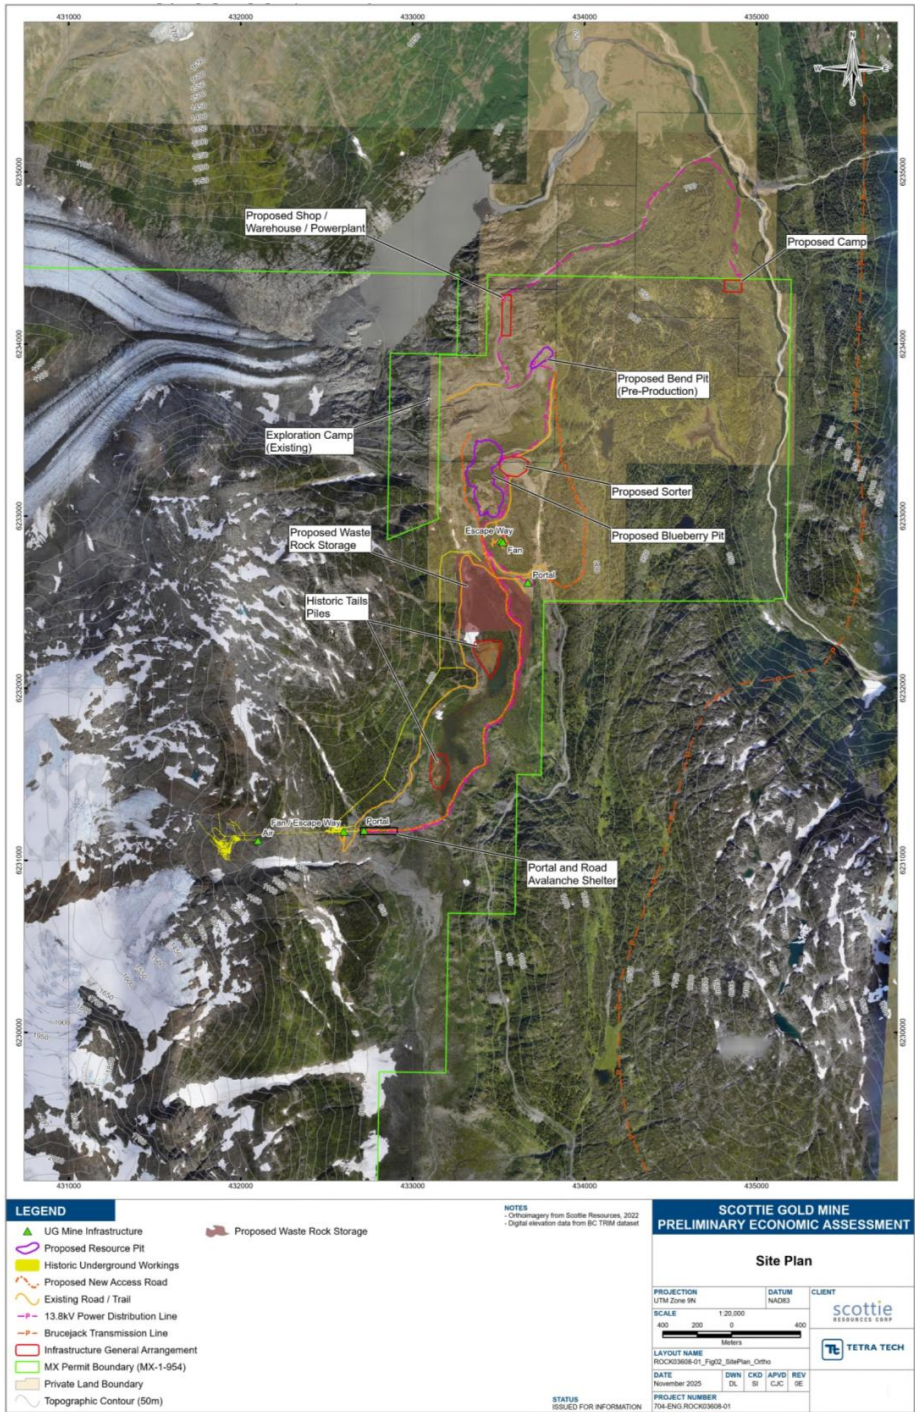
Site General Arrangement (Tetra Tech, 2025)
